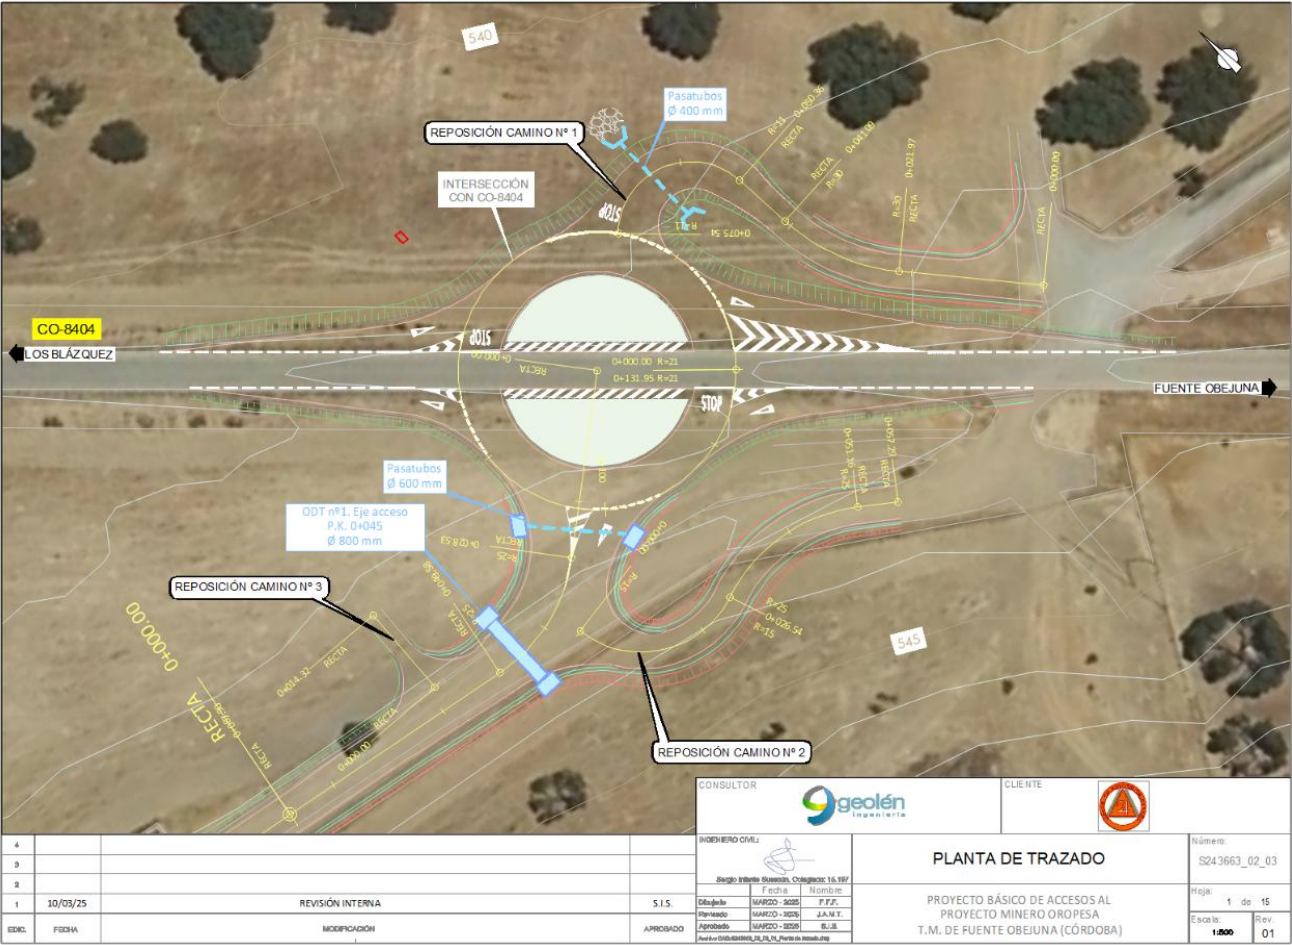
Approved design of Intersection between public road network and the dedicated site access road
